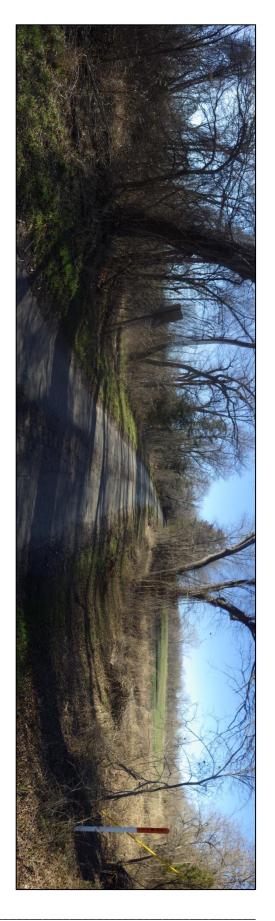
Top: View from west end of Proposed Bridge 8, facing west.
